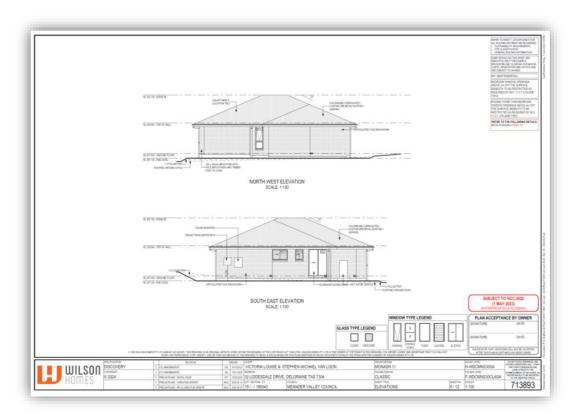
Elevations of proposed dwelling (provided by Wilson Homes).
